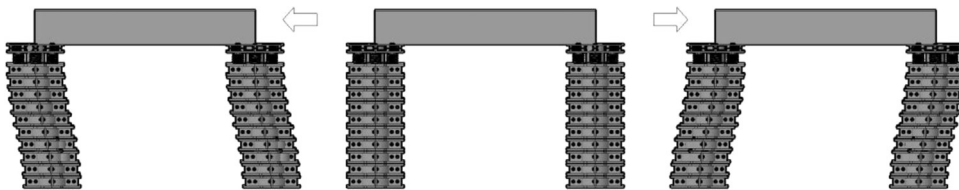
Deformed configuration of a single-storey frame structure provided with the MFD.
